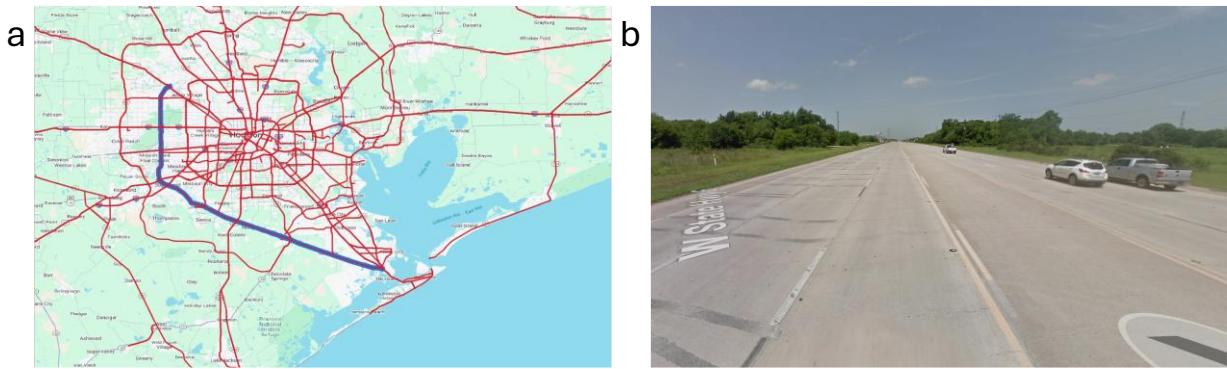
SH0006—N. Houston to Bayou Vista Case Study: (a) Location and (b) Typical Pavement Surface View.
